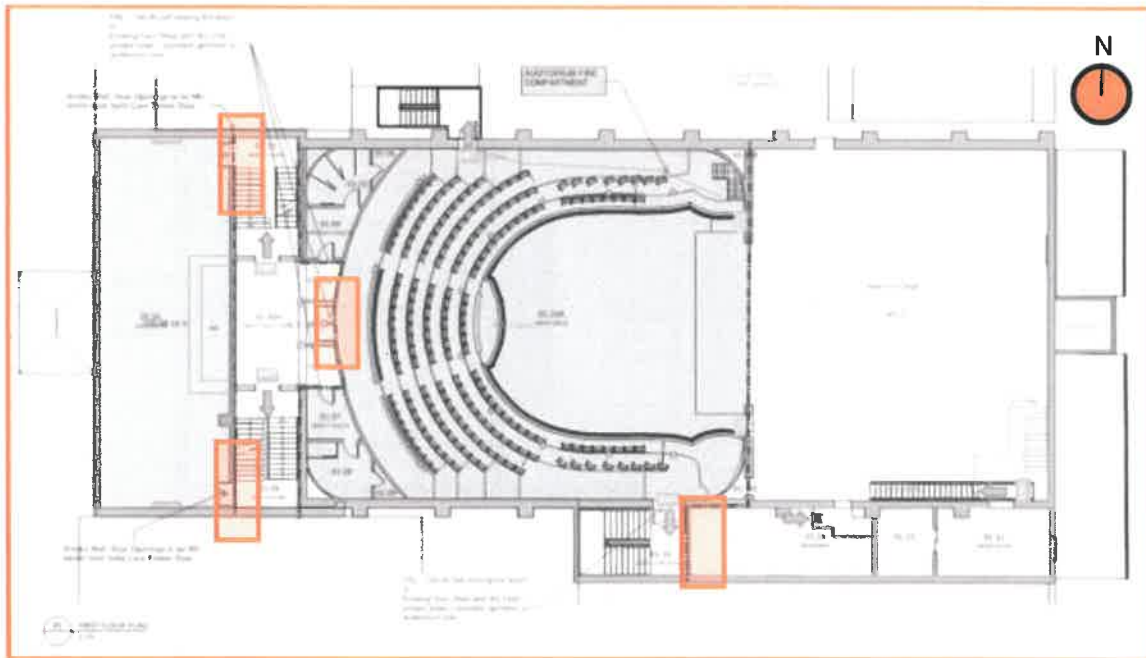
Sprinkler Protection of Existing Doors - Second Floor
